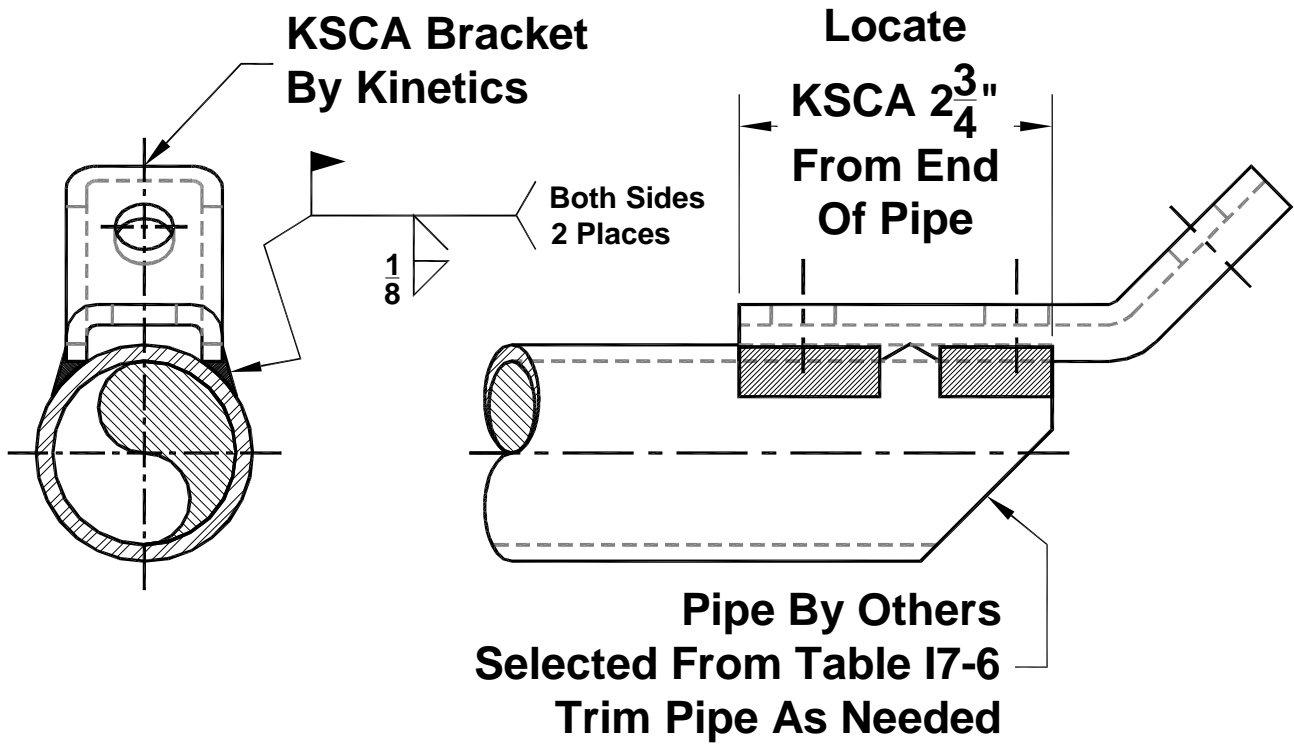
; Weld Attachment of KSCA Bracket to Schedule 40 IPS Pipe
